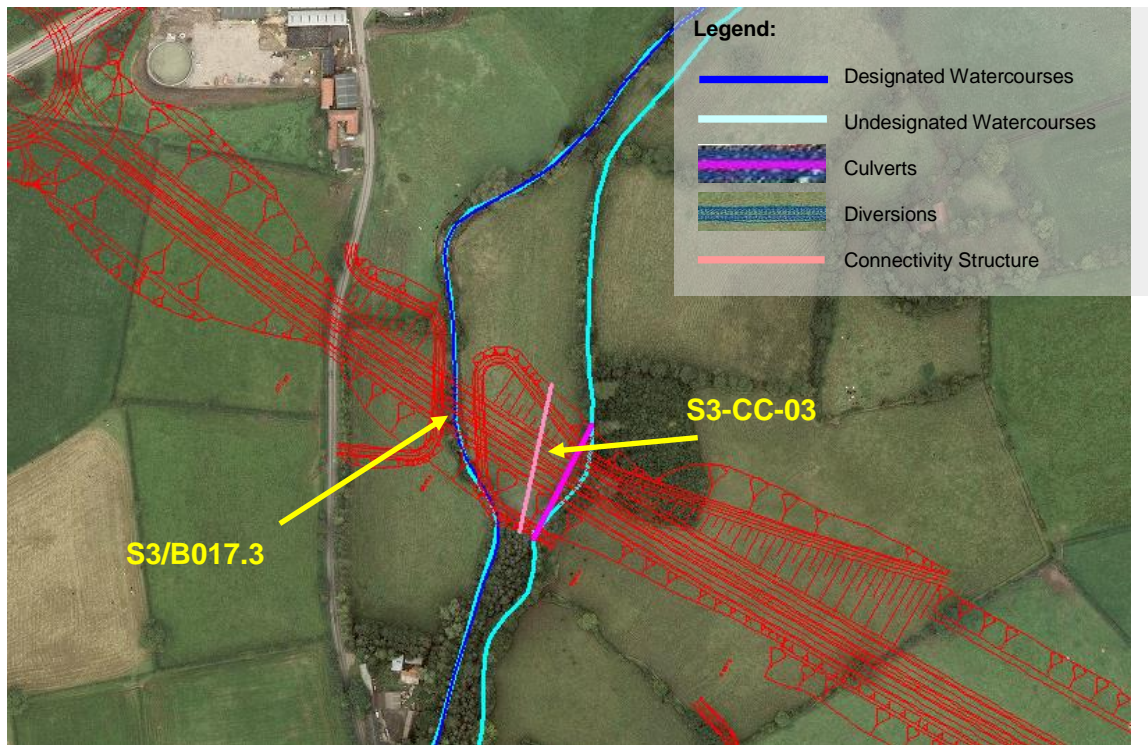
Plan of Ballygawley Water Bridge Crossing Location (S3/B017.3) and Connectivity Culvert arrangement (S3-CC-03)
